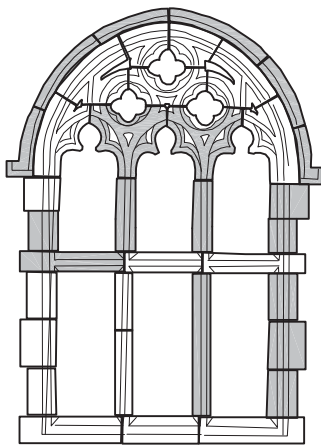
View of conservation works to the east opening on the second floor, showing the construction of the 1901 – 1903 walls.
